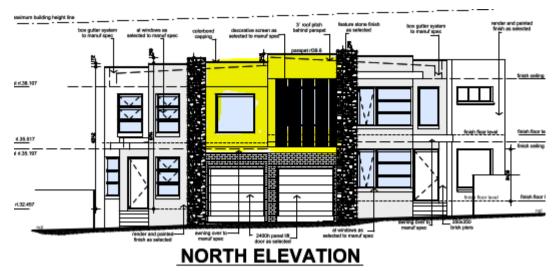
Front Elevation depicting portion of wall that is set forward of garage openings (in yellow highlight)
